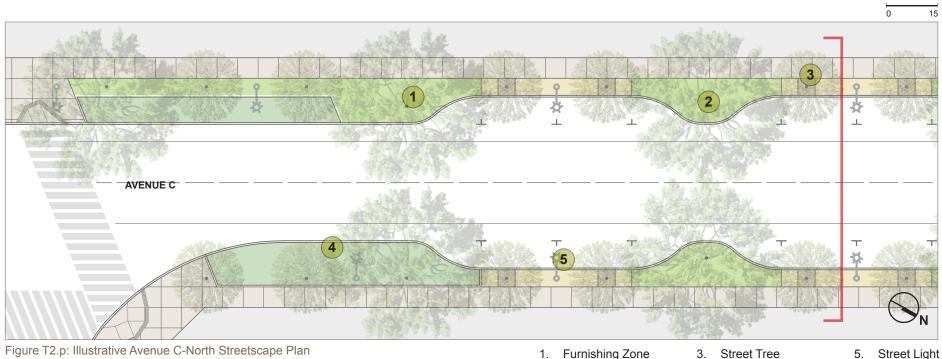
p: Illustrative Avenue C-North Streetscape Plan
